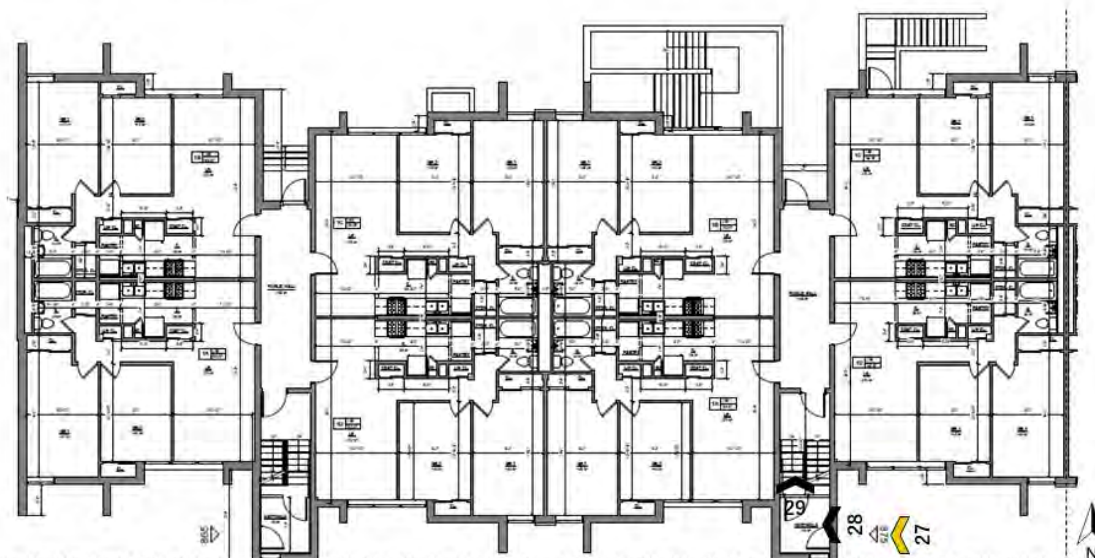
Block 5 - 875 Stuyvesant Avenue Photo Key Plan, First Floor
